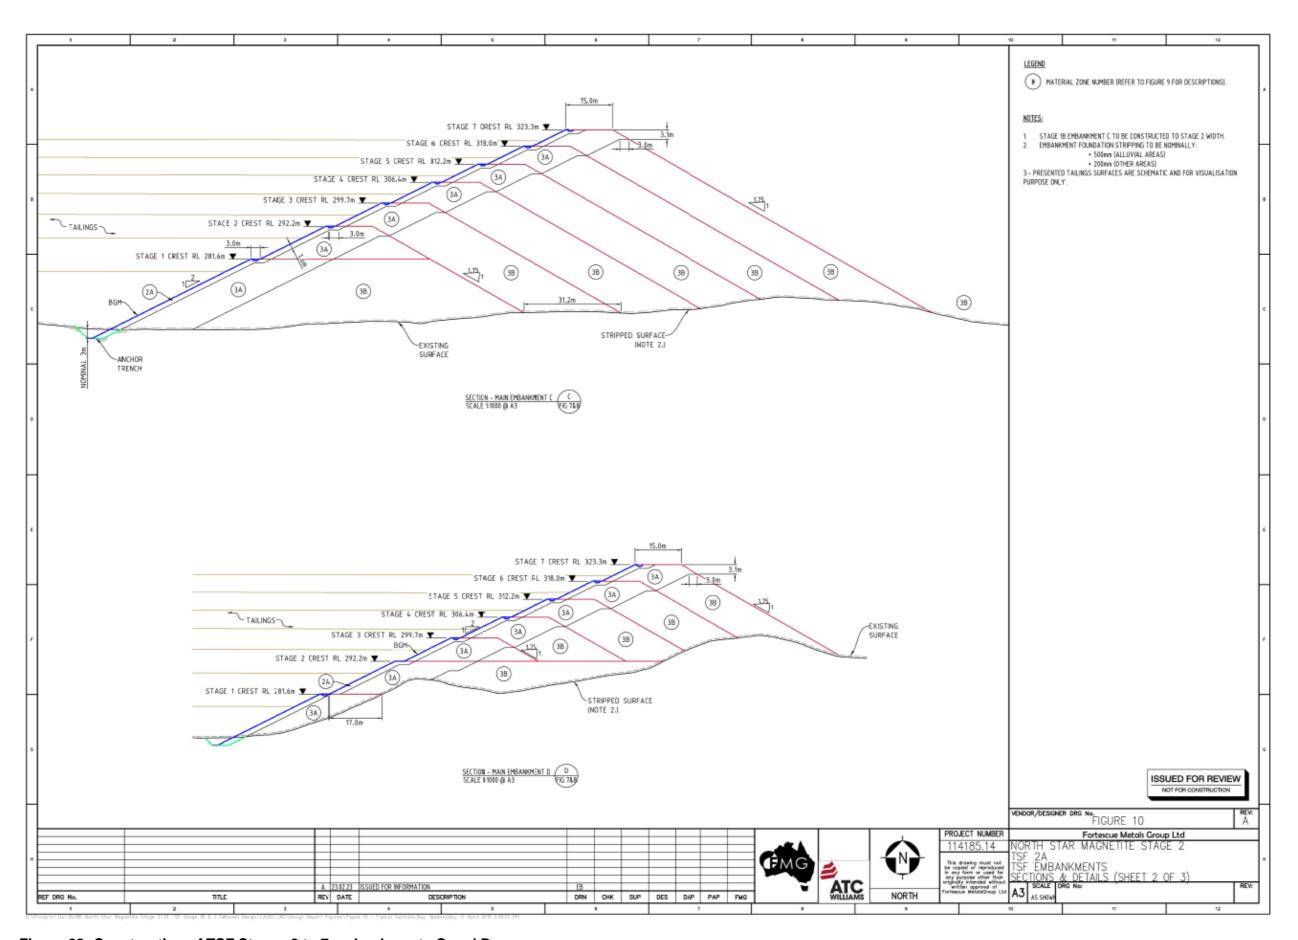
Construction of TSF Stages 2 to 7 embankments C and D
